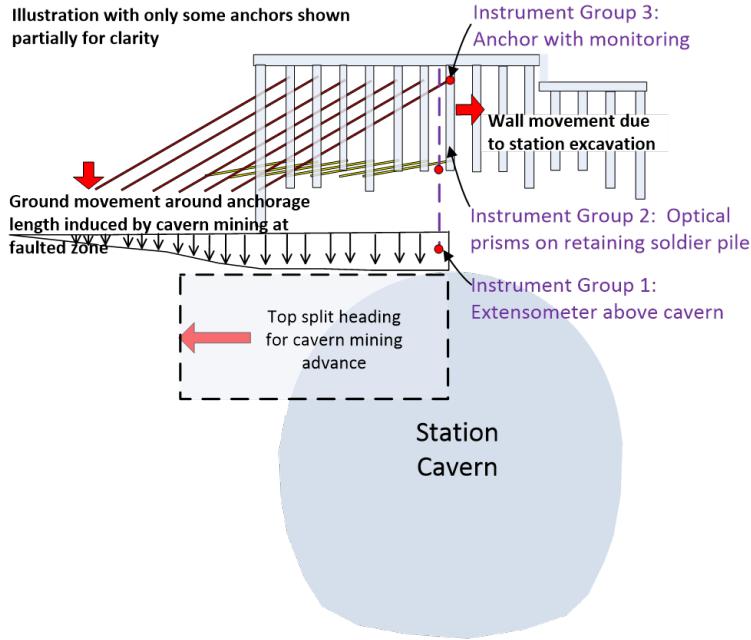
Illustration of interaction between station excavation headwall and cavern excavation
